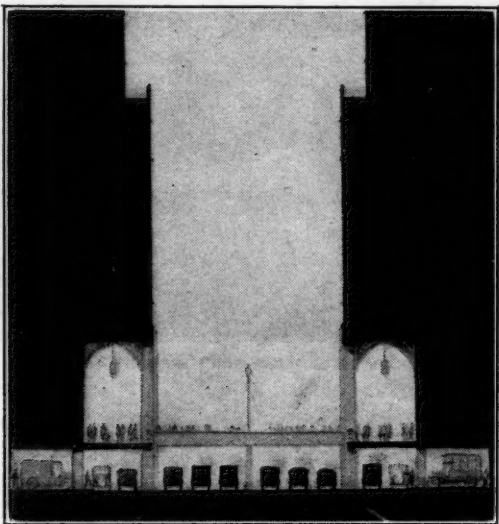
VIEW SHOWING PROPOSED TRAFFIC PLAN COMPLETED.
